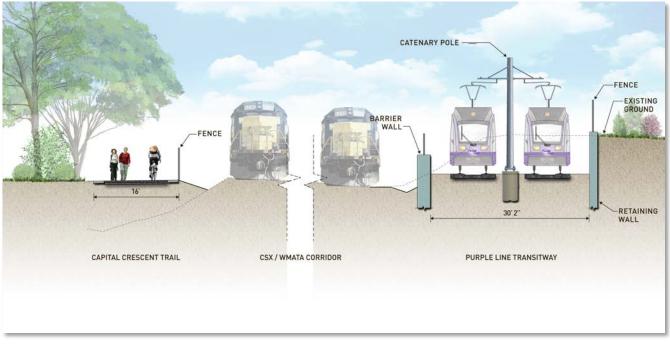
CSXT Right-of-Way Typical Section, Looking Southeast
